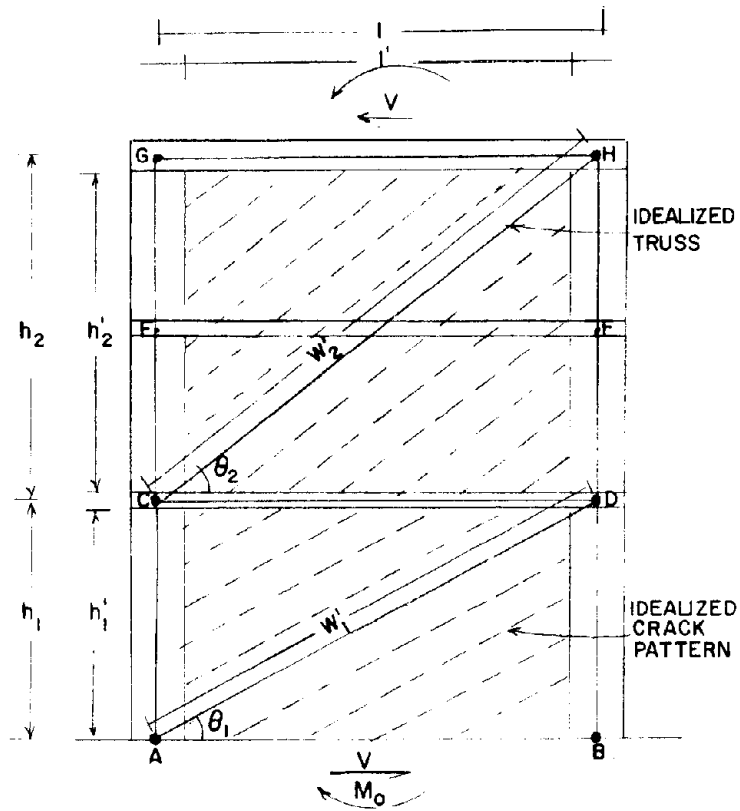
Idealized Crack Pattern and Shear Deformation of Cracked Wall
